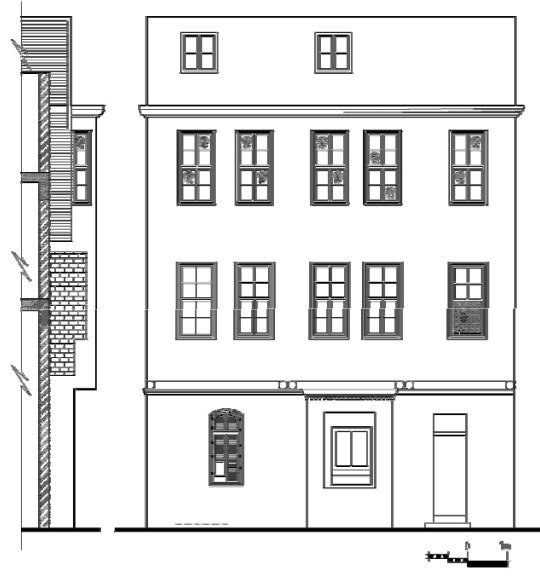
(left) Projected Western Façade (Right) Southern Façade
